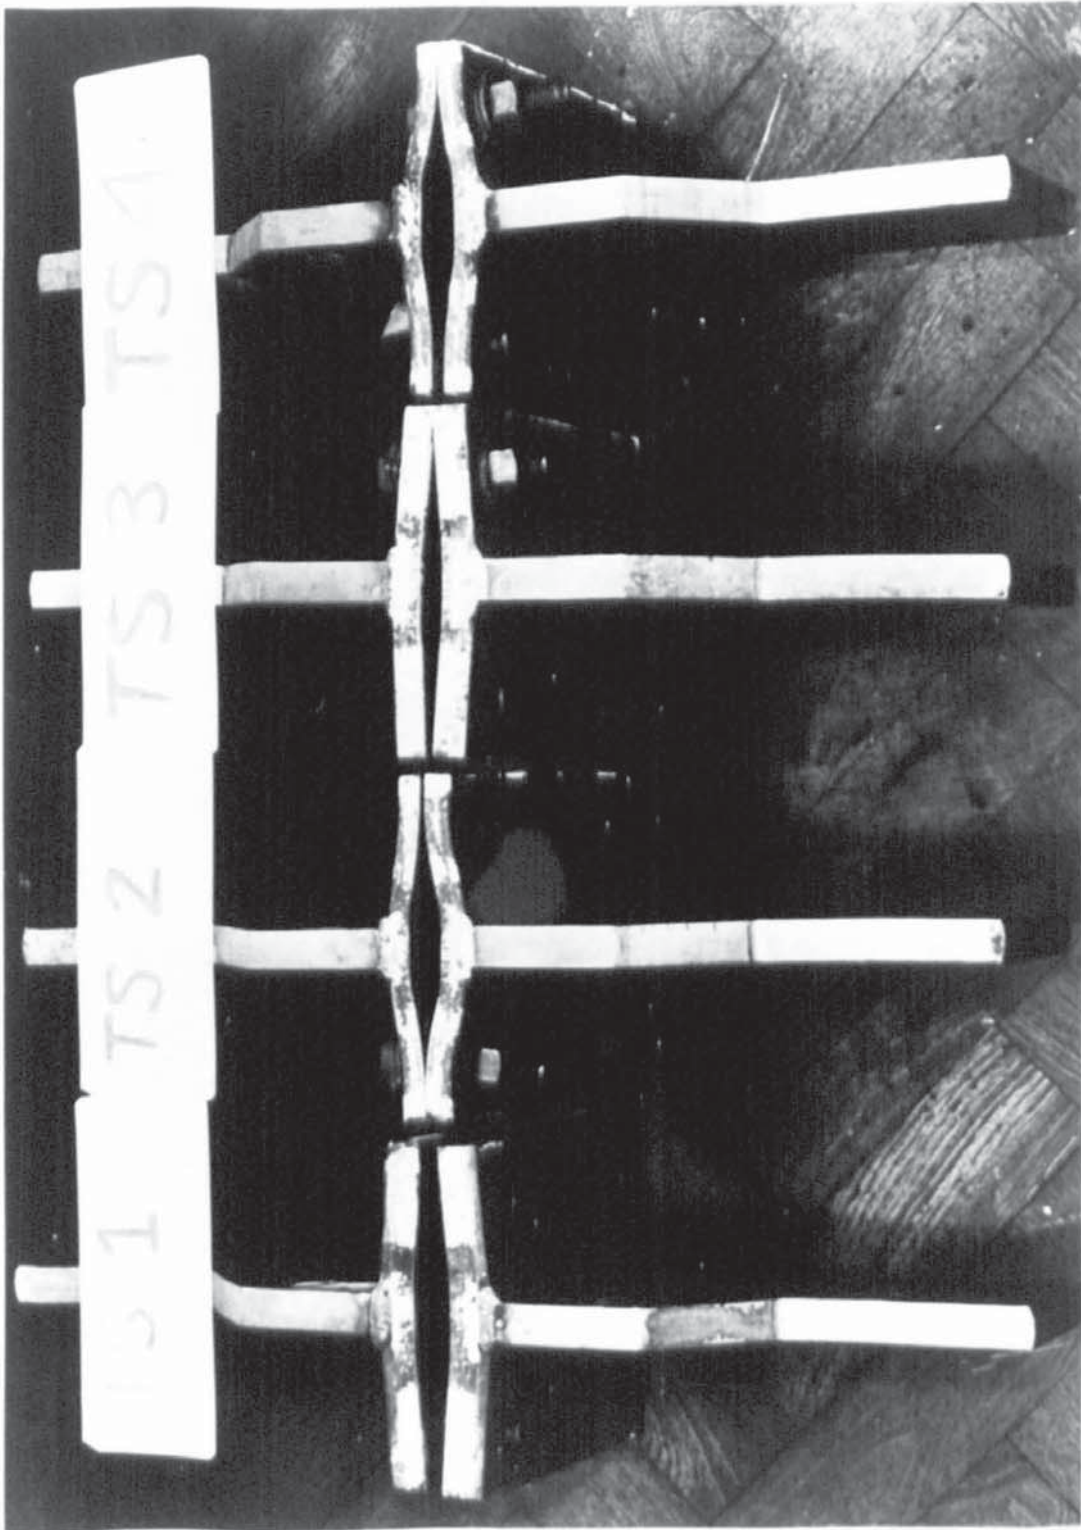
TEE STUB SPECIMENS AFTER FAILURE
